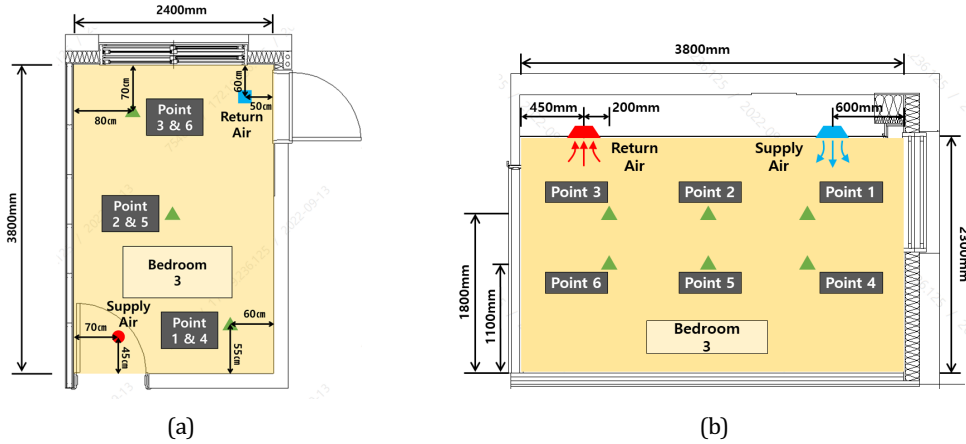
The Tracer-Gas Sampling Points: (a) Floor Plan, (b) Side Section
